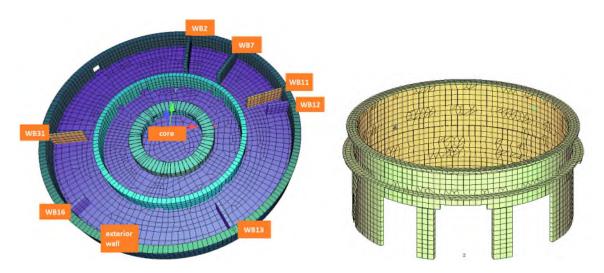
Relevant structural members: (left) Basement walls on the foundation plate beneath the calotte and (right) Upper part of the cylindrical internal structure protection wall at level 18.4*m*.
